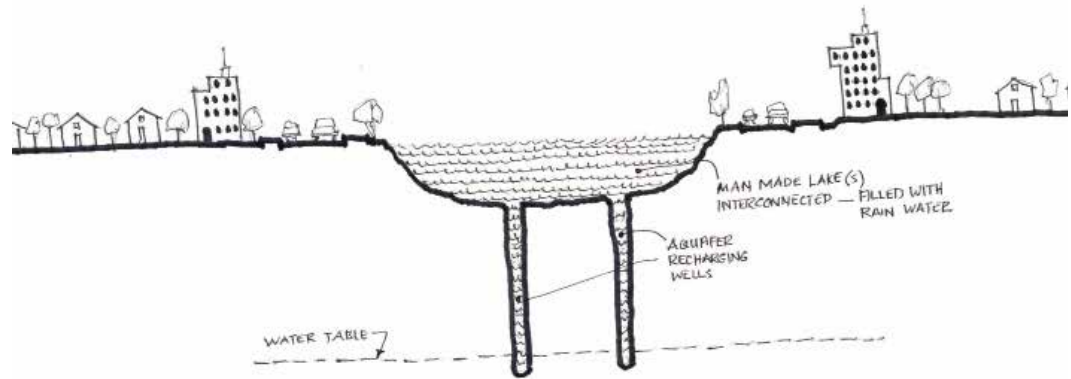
A section of a man-made lake dug out to act as natural rainwater collection basins.
